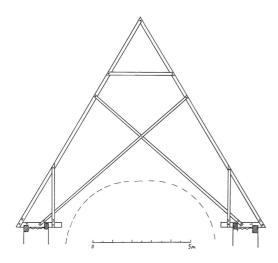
Section of the Gothic roofing in Säby with characteristic rafter feet and scissor beams. Each part in the rafter foot was numbered before assembly. Drawing by R. Gullbrandsson.
